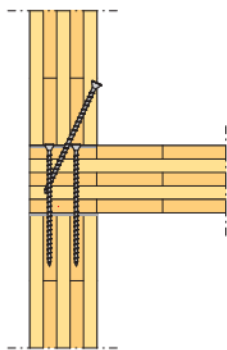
Joint between wall panel and floor slab using long wood screws.
